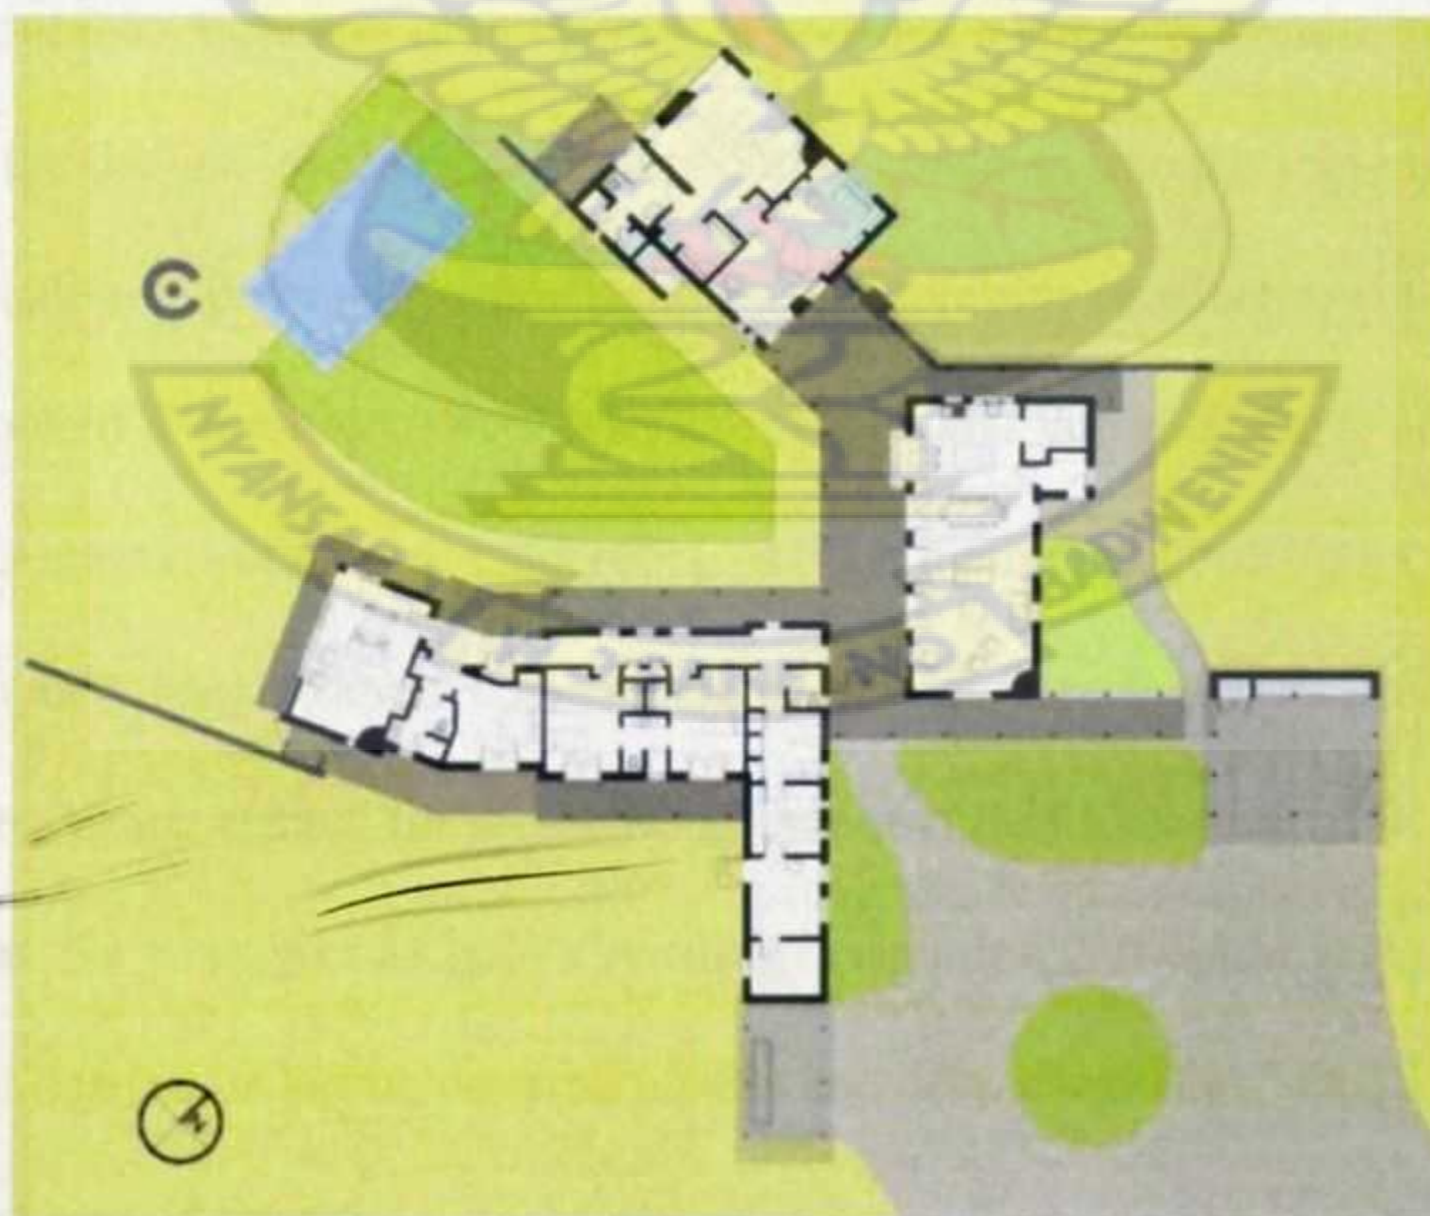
, *Floor plan of Milder House (Signer Harris Architects, 2007).
